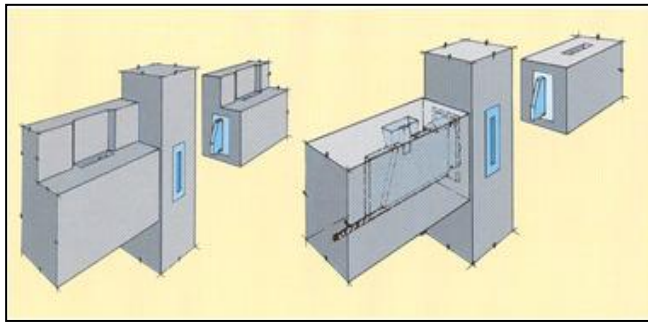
Hidden corbel connection type (Spenco Systems, 2009)
